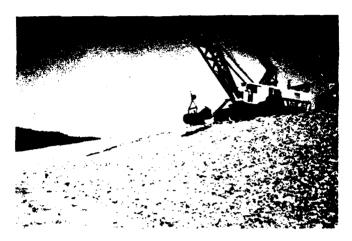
Placing Bedding with 70-Ton Crane and Drag Bucket
